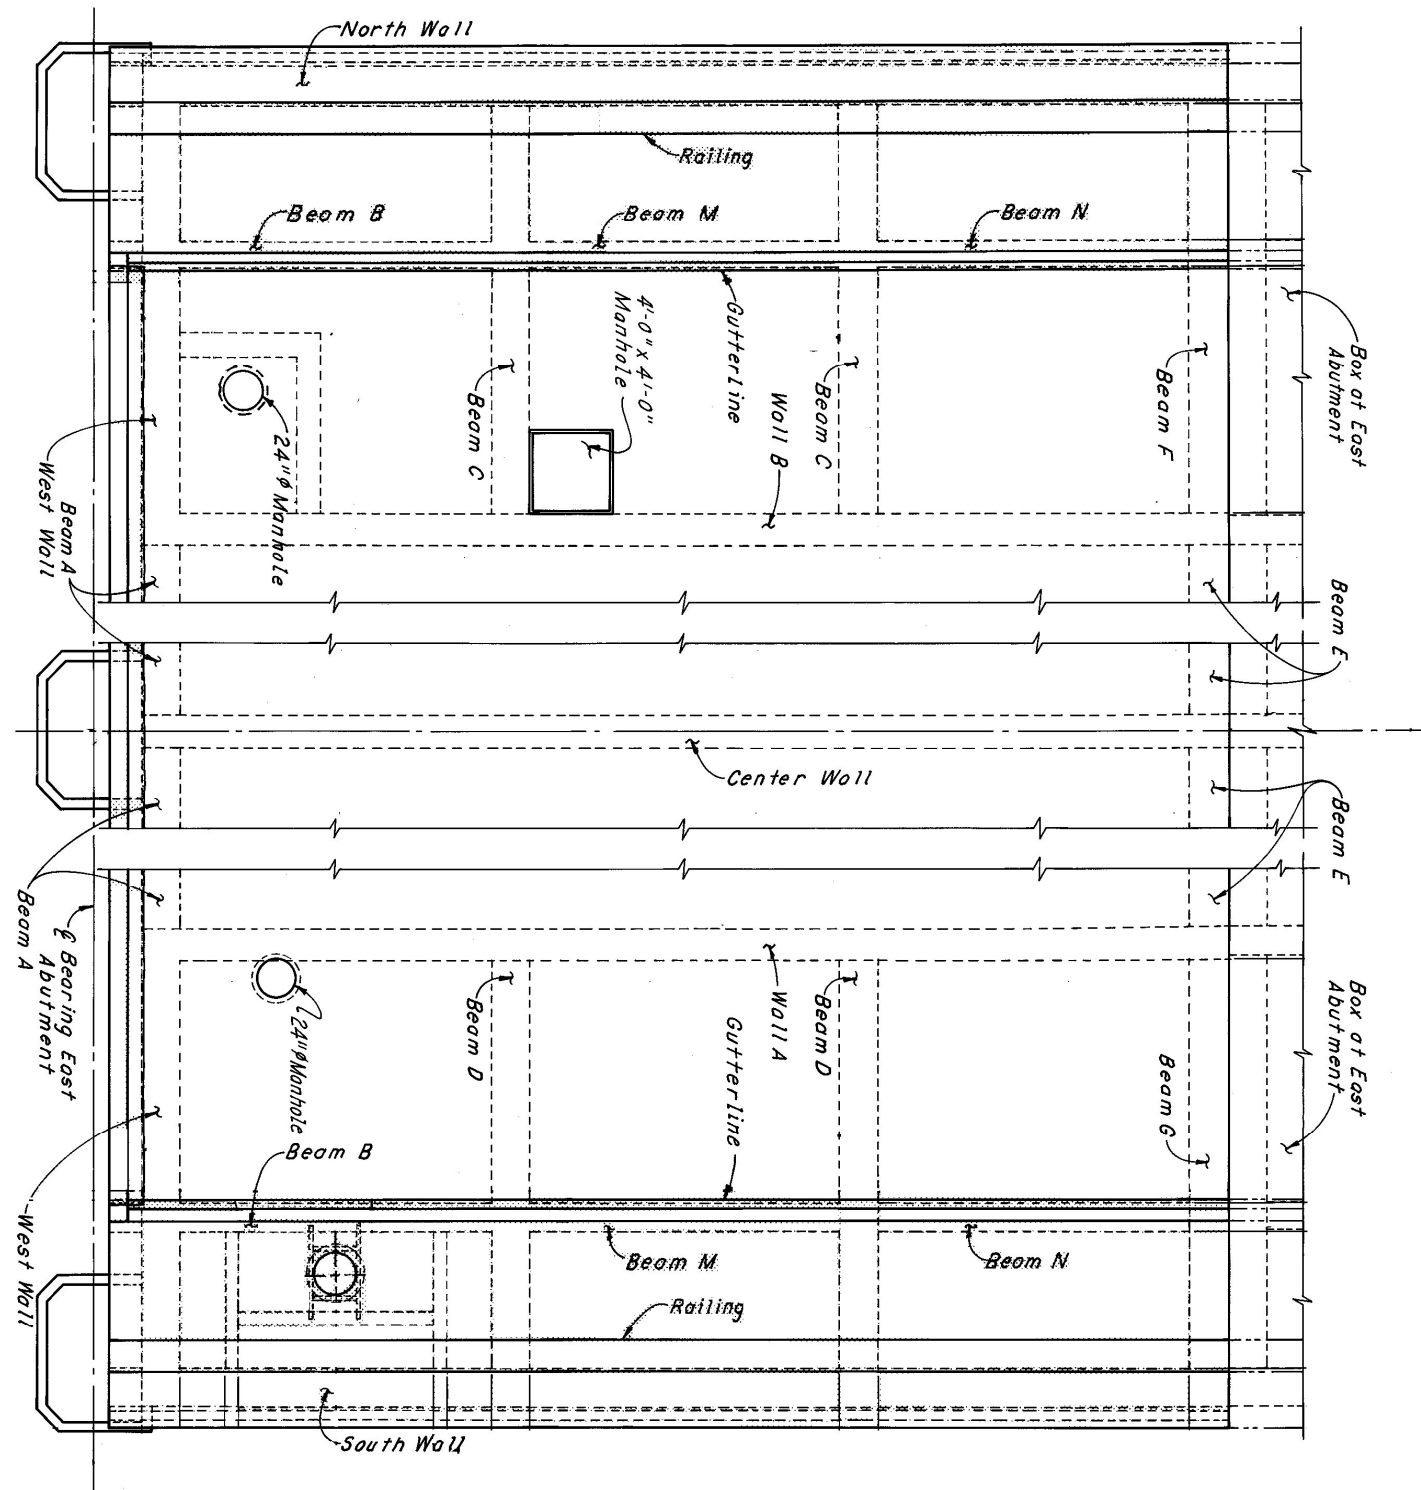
Partial Plan of East Abutment Concrete Cellular Spans.
